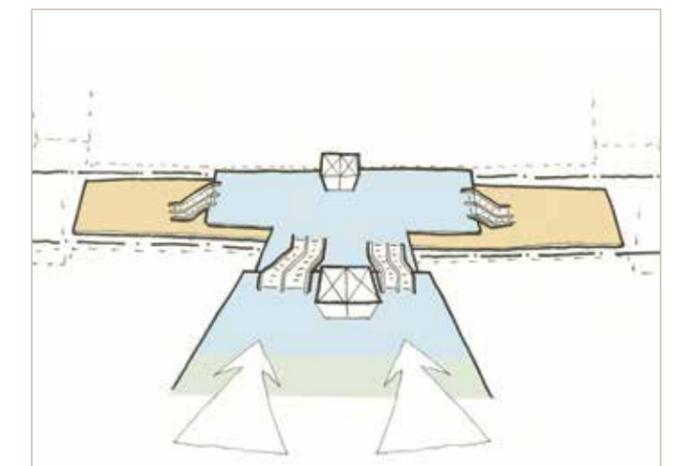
The option developed by the study team for the Doncaster Park-and-Ride station envisages passengers entering the station building through an access point that also forms an underground connection between the car parking area and the station platforms
